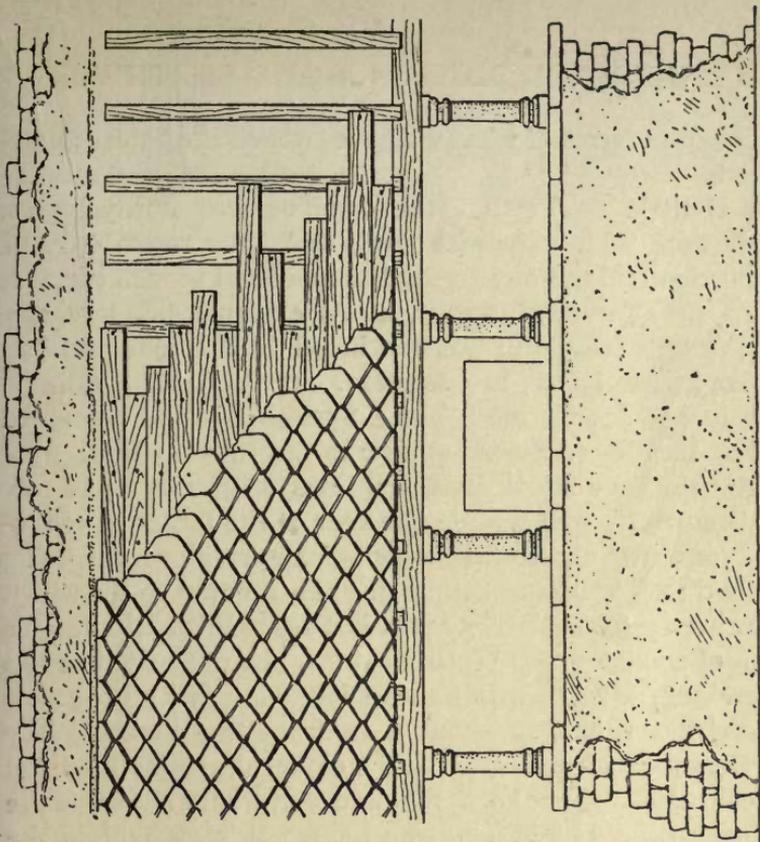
Section and Elevation of external Corridor of House. Modified from Middleton's restoration. (About 5 ft. to 1 in.)
